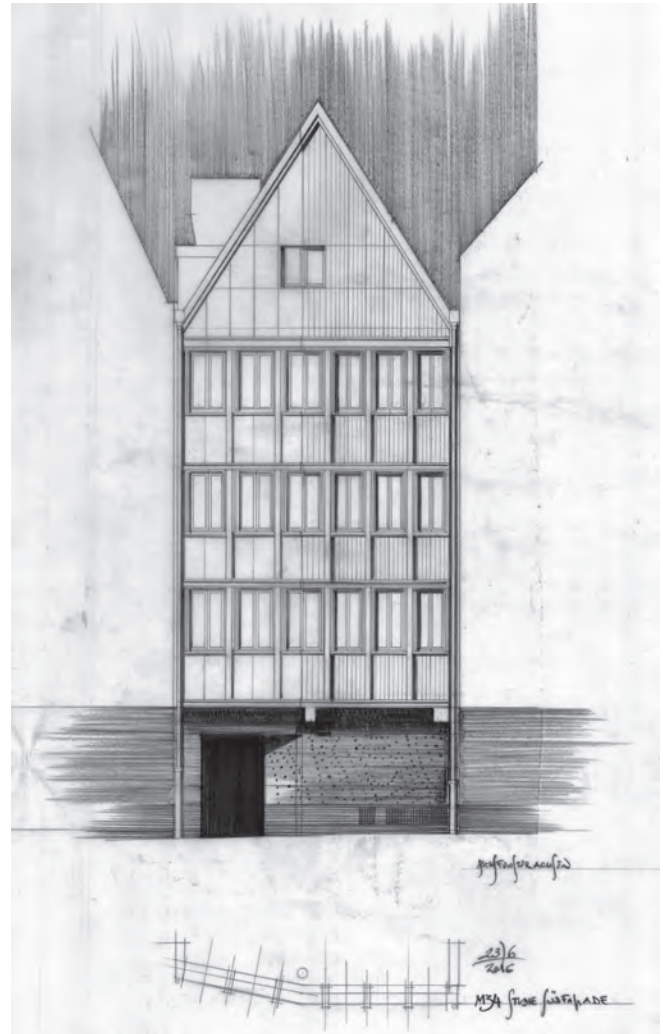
Dom Römer, House M34 facade study (drawing by author)
